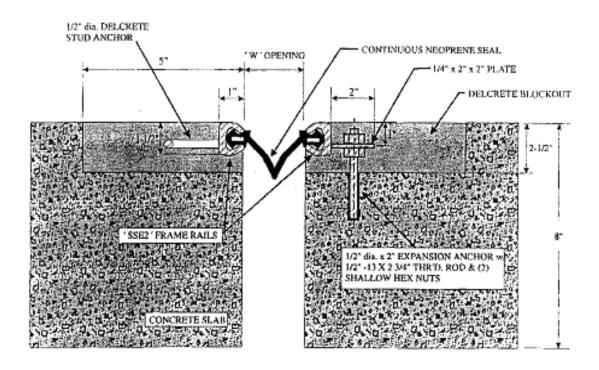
Delcrete elastomeric concrete/Steelflex strip seal system (24).
